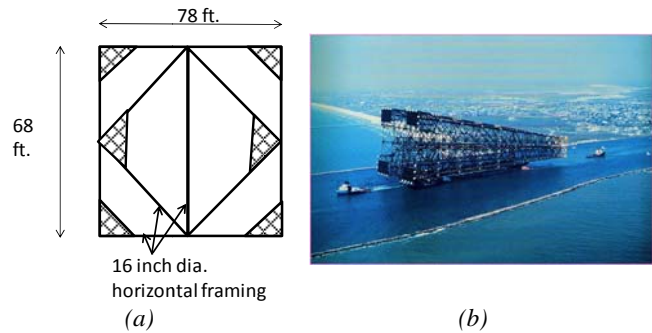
Mudmat layout for steel piled jacket (a) schematic of shallow water platform mudmats (b) deeper water mudmats
